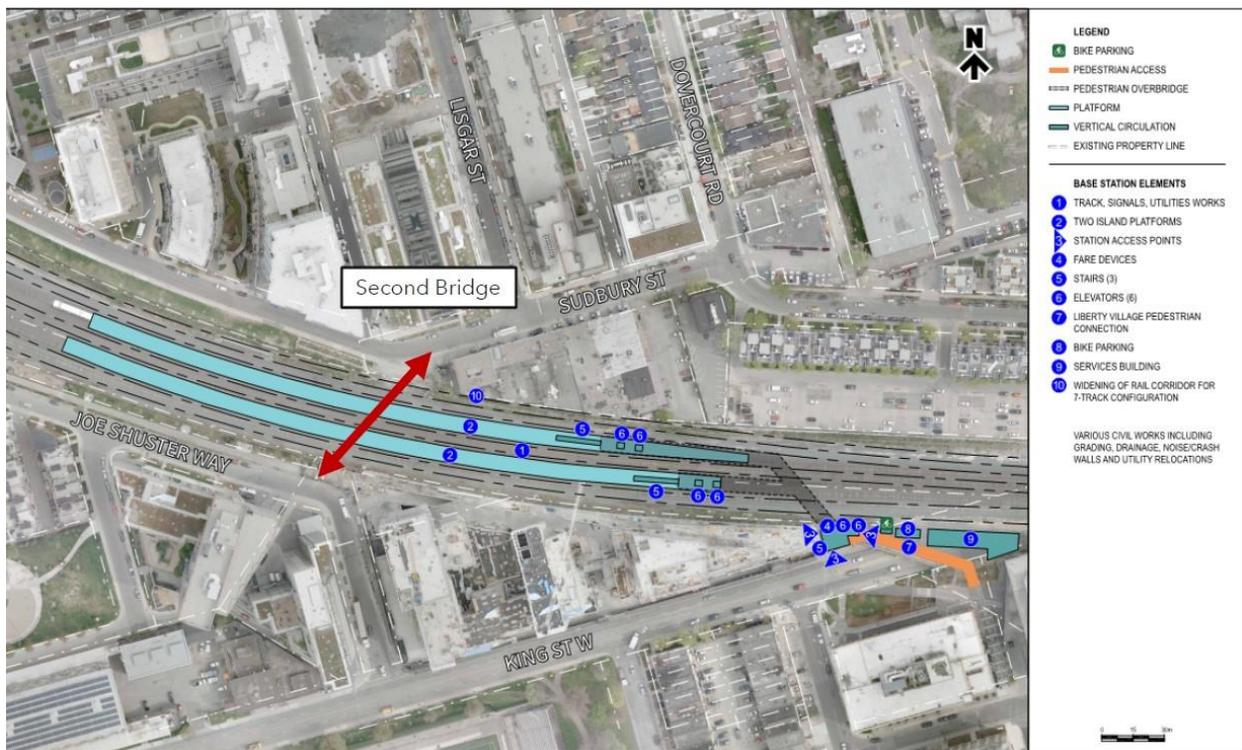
Conceptual plan of King-Liberty Station. Source: Metrolinx (May 2020). Note: Station plan shown above is indicative, and does not represent a final design.
